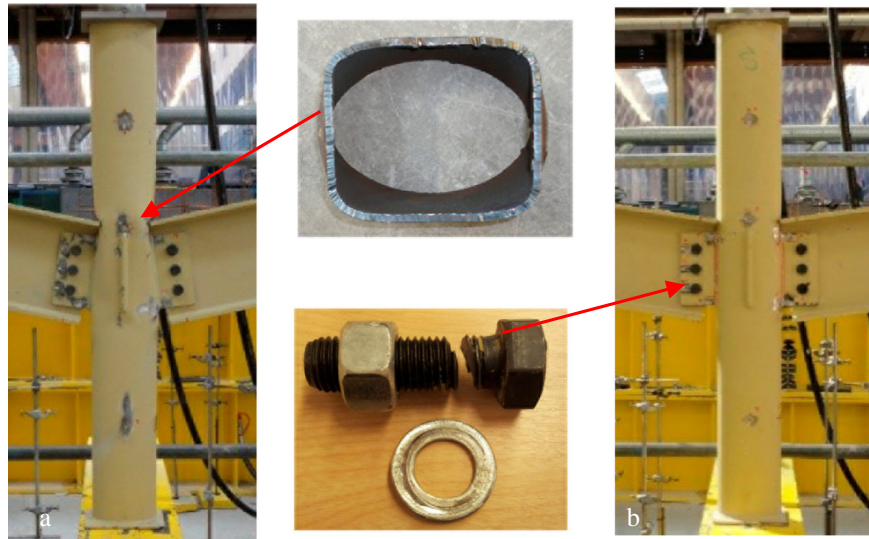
Typical failure modes: (a) hollow connection (Joint-A); (b) concrete-filled connection (Joint-AC).
